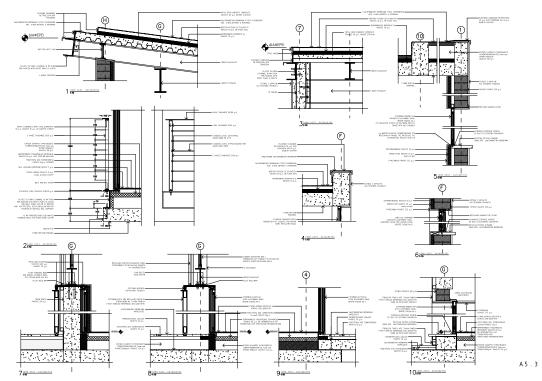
Residence Project System Details from Roof and Window by Simpraxis Architects (Bozatlı)
